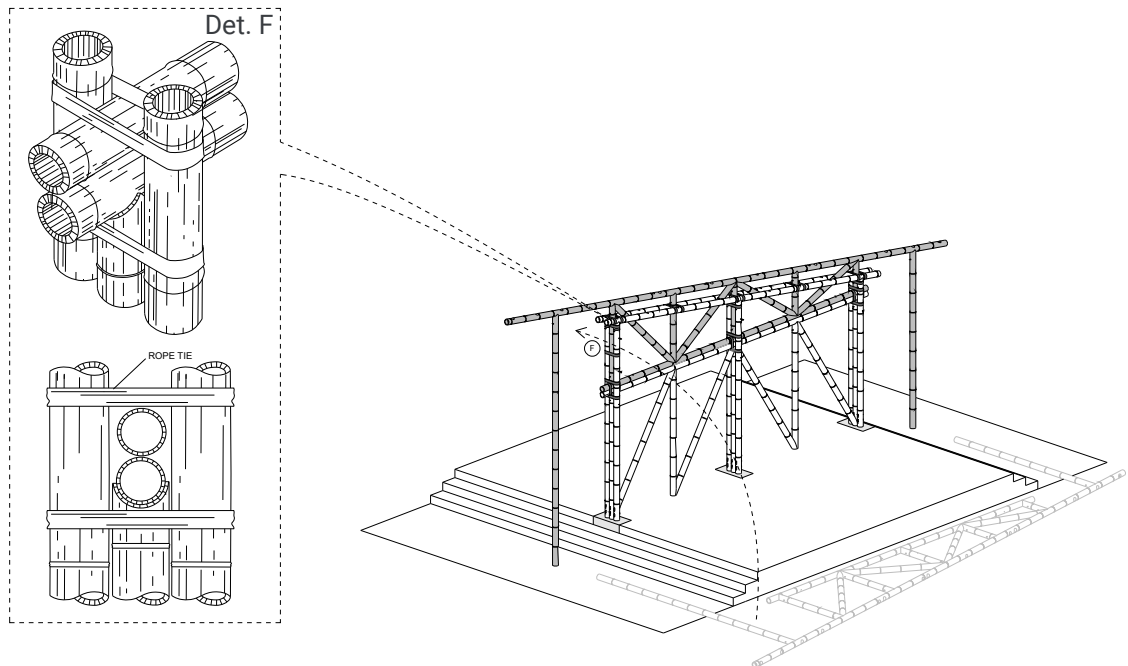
Truss placed on main columns and beams. Author's graphics.
